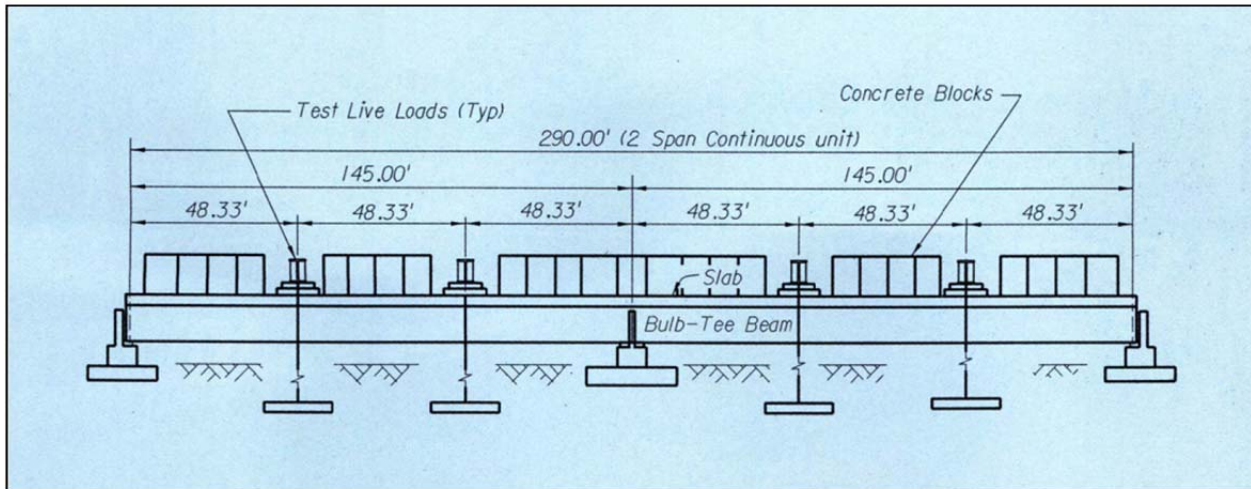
Elevation view of prototype girder line (from Garcia, 1993)
